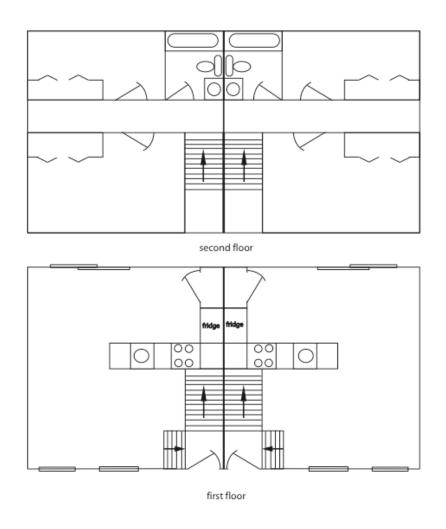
Floor-plan of two-story duplex apartments (not to scale).
